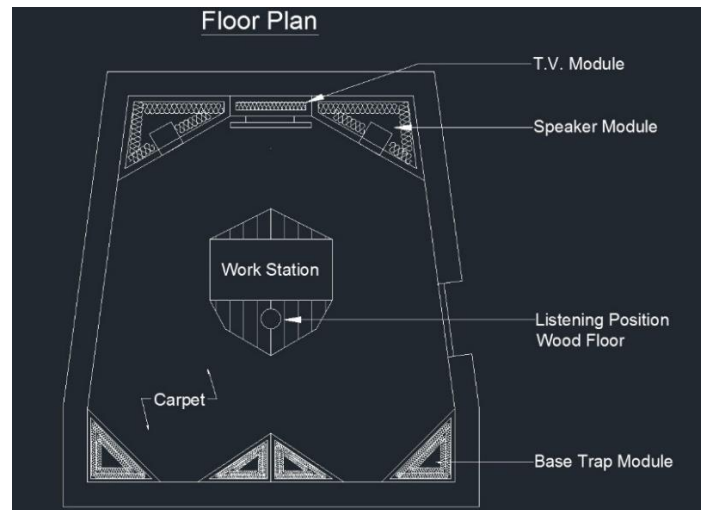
Panelized Control Room Floor Plan Showing Room shape and Module Placement
